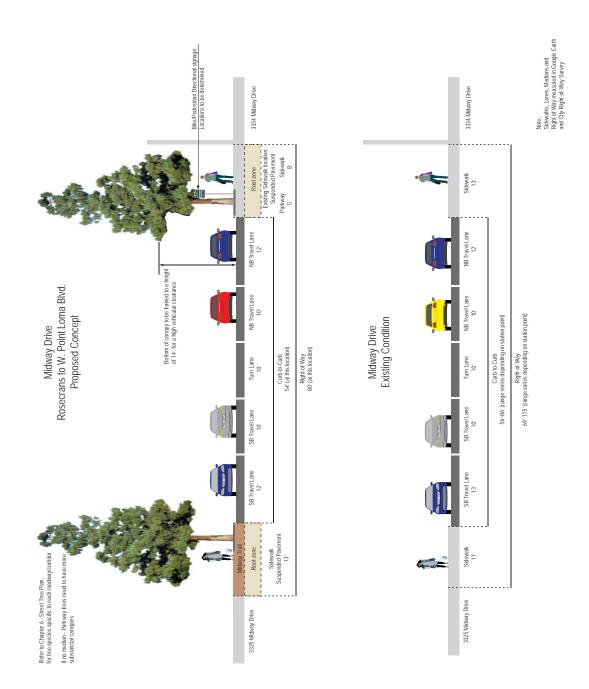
Street Concept Plan Exhibit - Midway Dr., Rosecrans St. to W. Point Loma Blvd.
